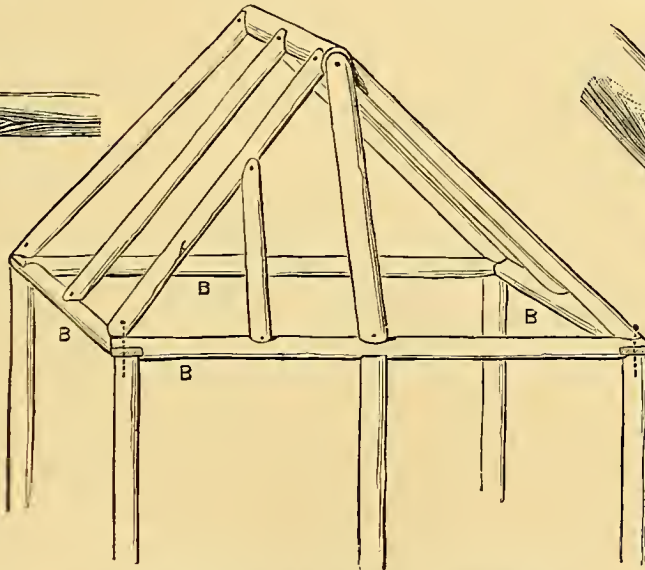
CONSTRUCTION OF ROOF OF SMALL SUMMER-HOUSE.
